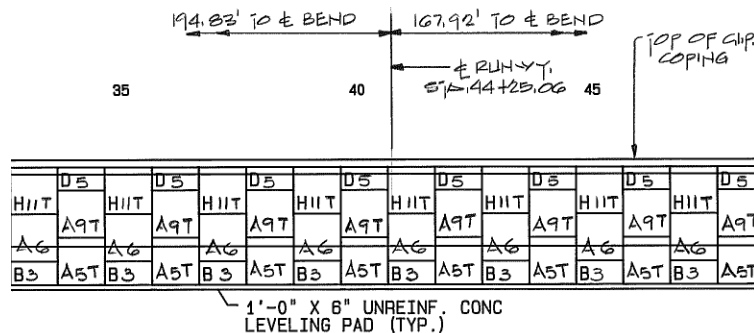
Elevation of typical MSE wall panel layout at runway. Number after letter indicates number of tie strips attached to each panel e.g., "A6" indicates 6 tie strips.
